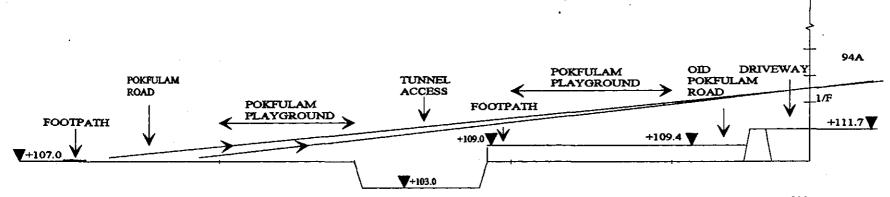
SECTION THROUGH POKFULAM ROAD
